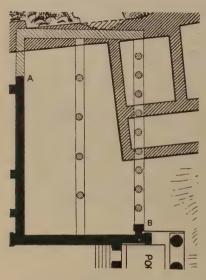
PROPYLAEA: PLAN OF NORTHEAST CORNER SHOWING EXTENSION OF NORTHEAST WALL (A), AND SOUTHEAST ANTA (B).
